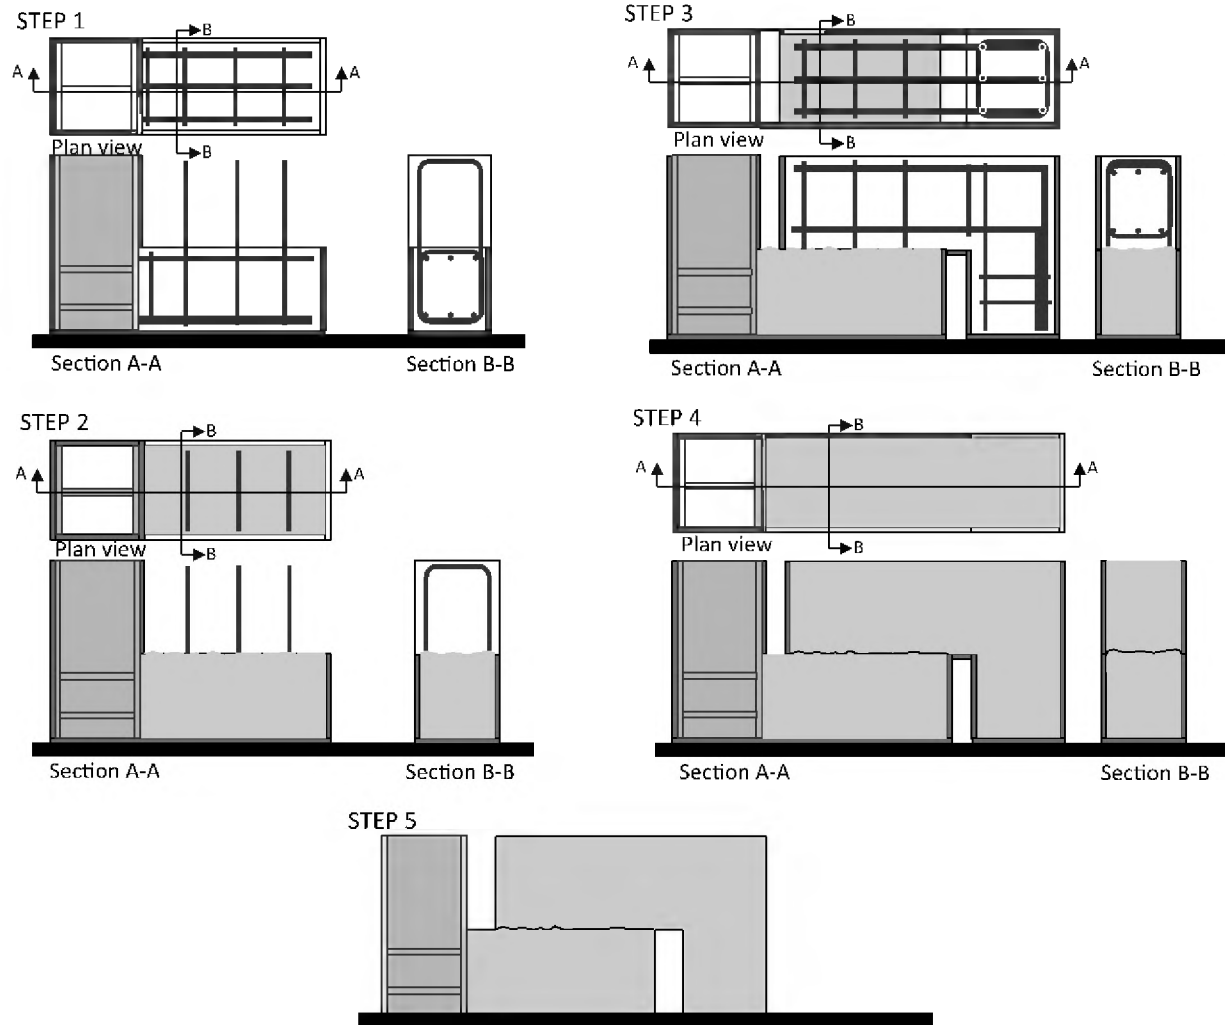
Steps for the fabrication of the shear friction specimens. The steps will remain the same for both steel reinforcement configurations. Step 1: Bottom mold with surface up. Step 2: Pour concrete in first part (day 1). Step 3: Add additional mold. Step 4: Pour concrete second part (day 2). Step 5: Cure 28 days
